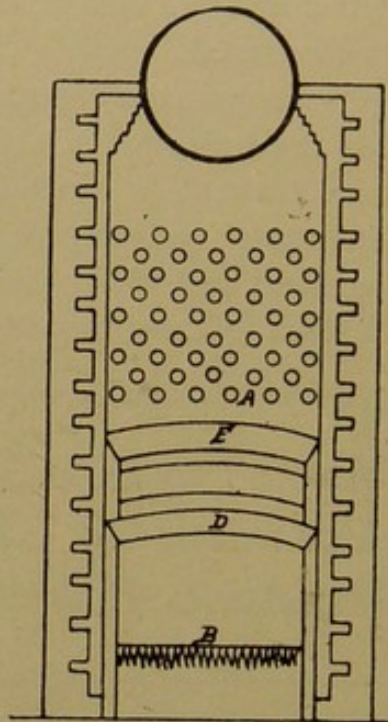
THE MILLER WATER-TUBE BOILER SETTING.
